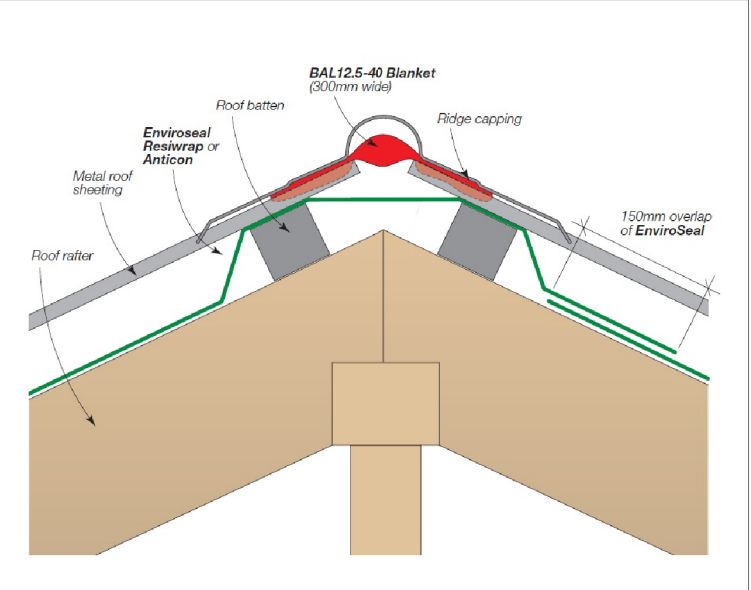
Hip/Ridge Detail – Steel Roof (BAL-12.5 – BAL-40)
